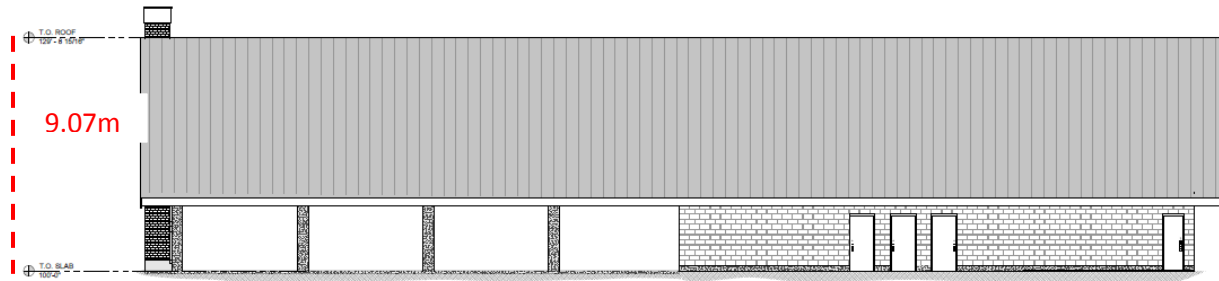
Demonstrates height of proposed building for separation calculation.
